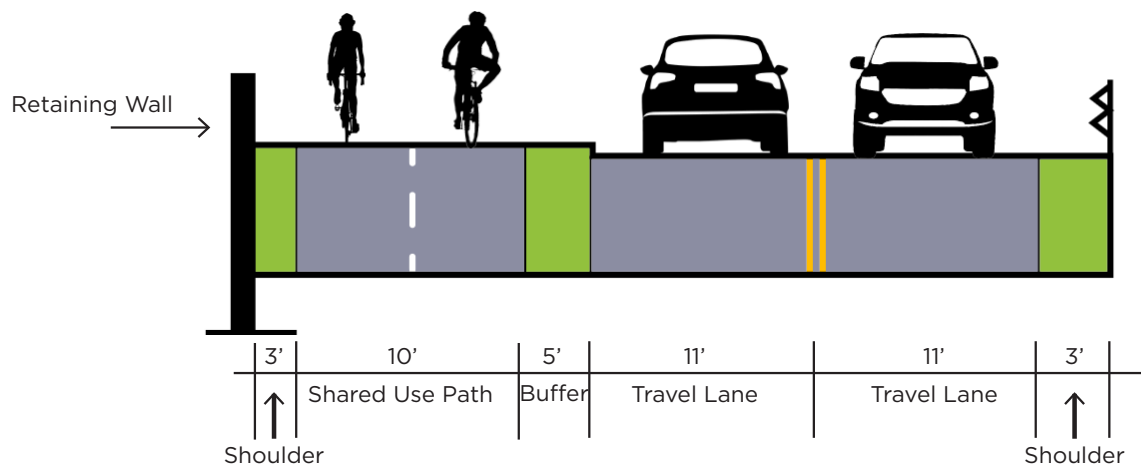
Hogsback Lane Proposed Section (looking northbound)
